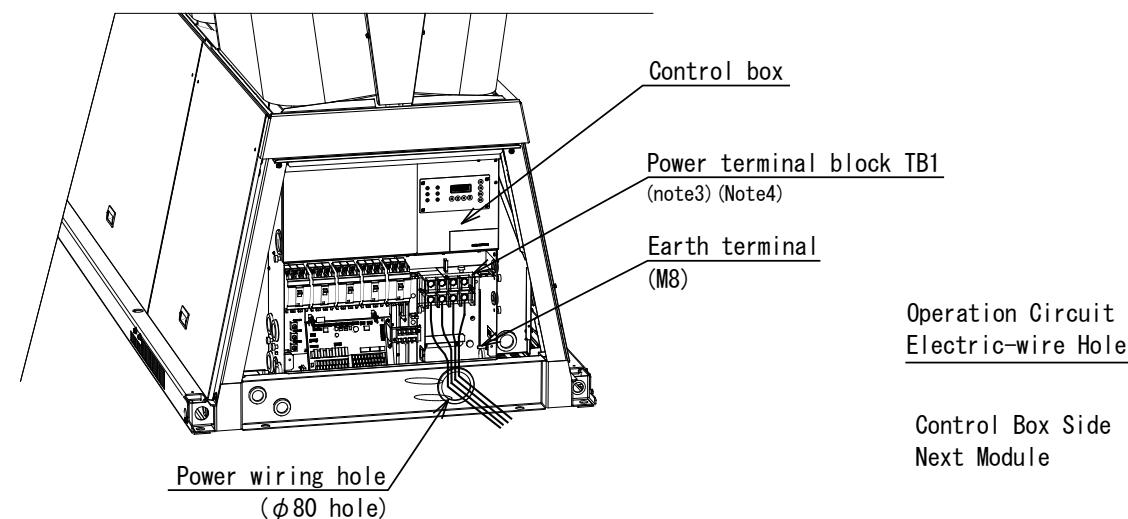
Figure A - Power supply wiring example (utilise the right-side power supply wiring hole)
